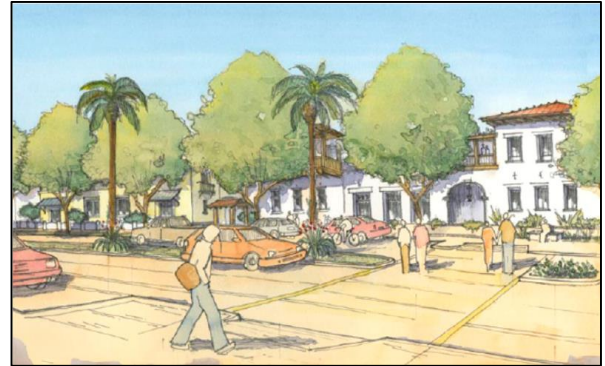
Harrison Street from Grapefruit Boulevard to Avenue 50 looking north – Proposed Option 1
